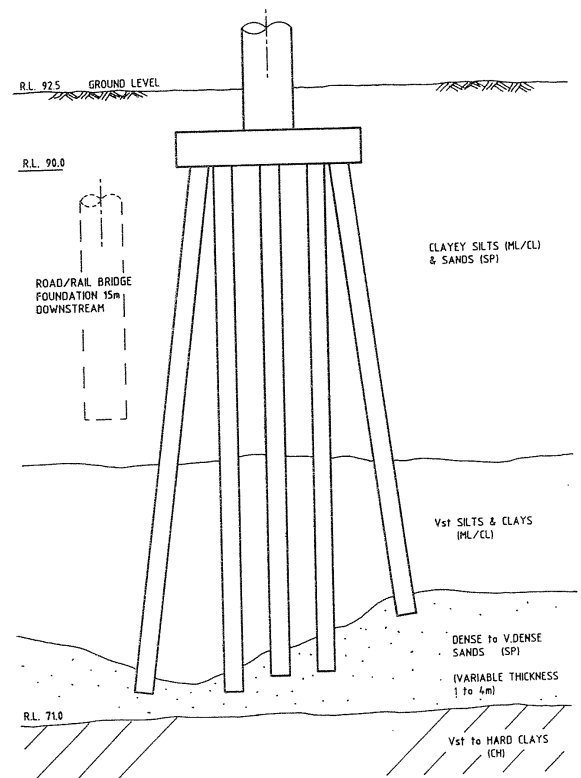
Cast-in-place Concrete Piles for Approach Piers
